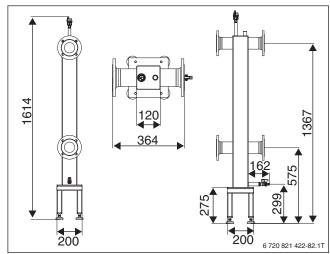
Low loss header assembly for 2 boiler cascade 2 × 200 kW, 2 × 250 kW or 2 × 300 kW
